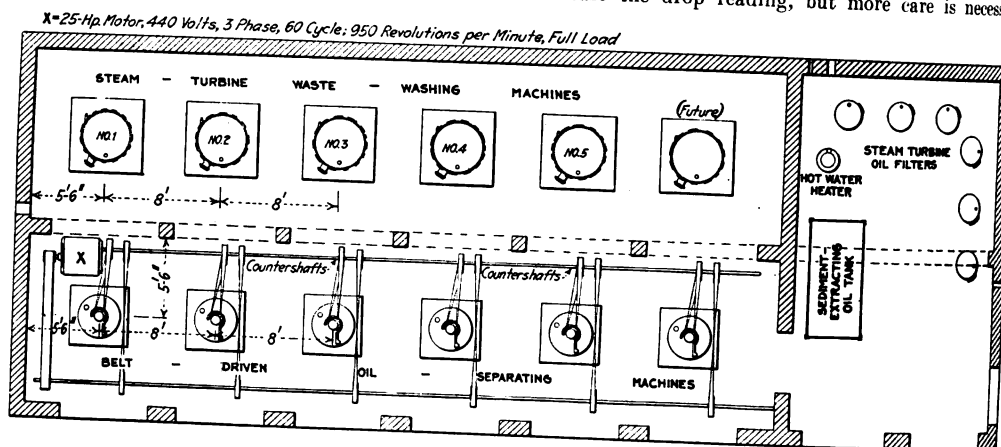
PLAN VIEW OF OIL-RECLAIMING PLANT
